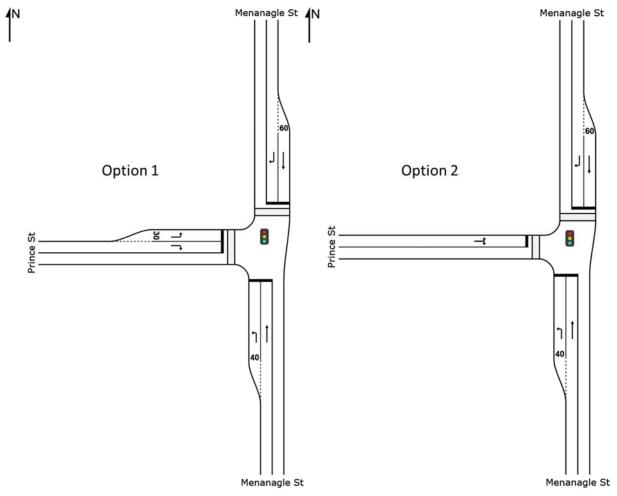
Prince Street / Menangle Street Proposed Signal Control Plan
